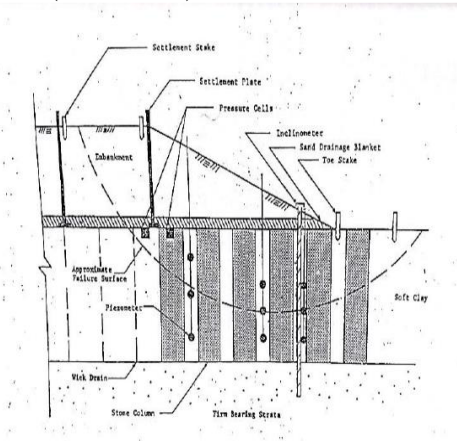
TYPICAL FIELD INSTRUMENTATION FOR EMBANKMENT CONSTRUCTED ON STONE COLUMN IMPROVED SOFT CLAY.
